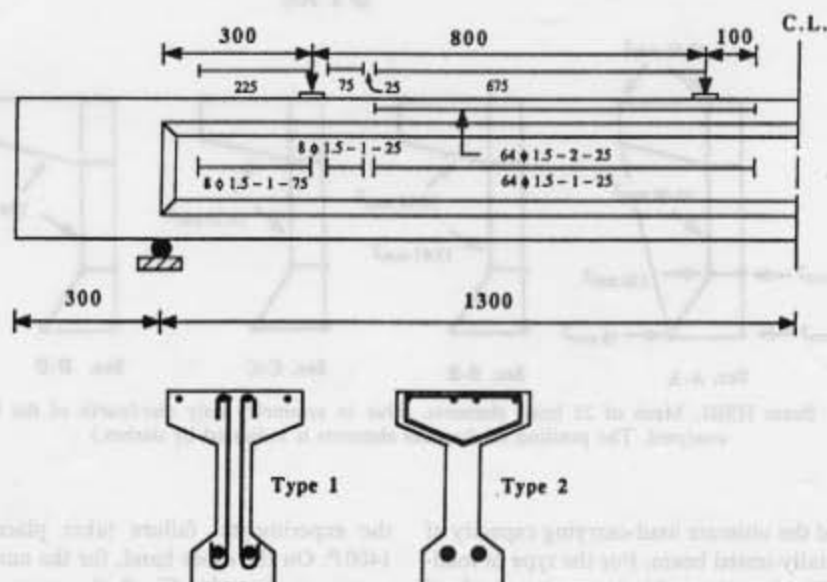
Beam HSB1 [7]. Dimensions and reinforcement detailing.
